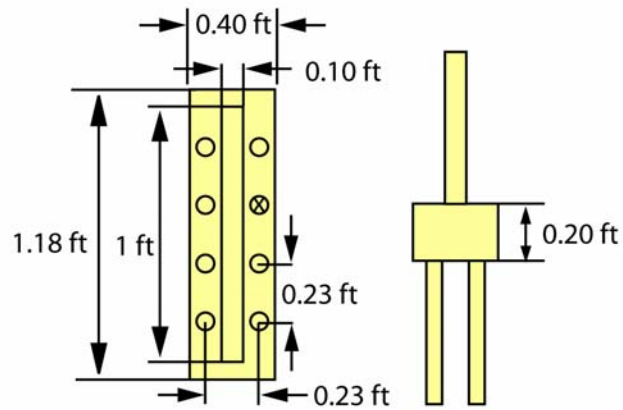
Plan and elevation view of model complex pier 2 (Type B, All dimensions are in feet).
